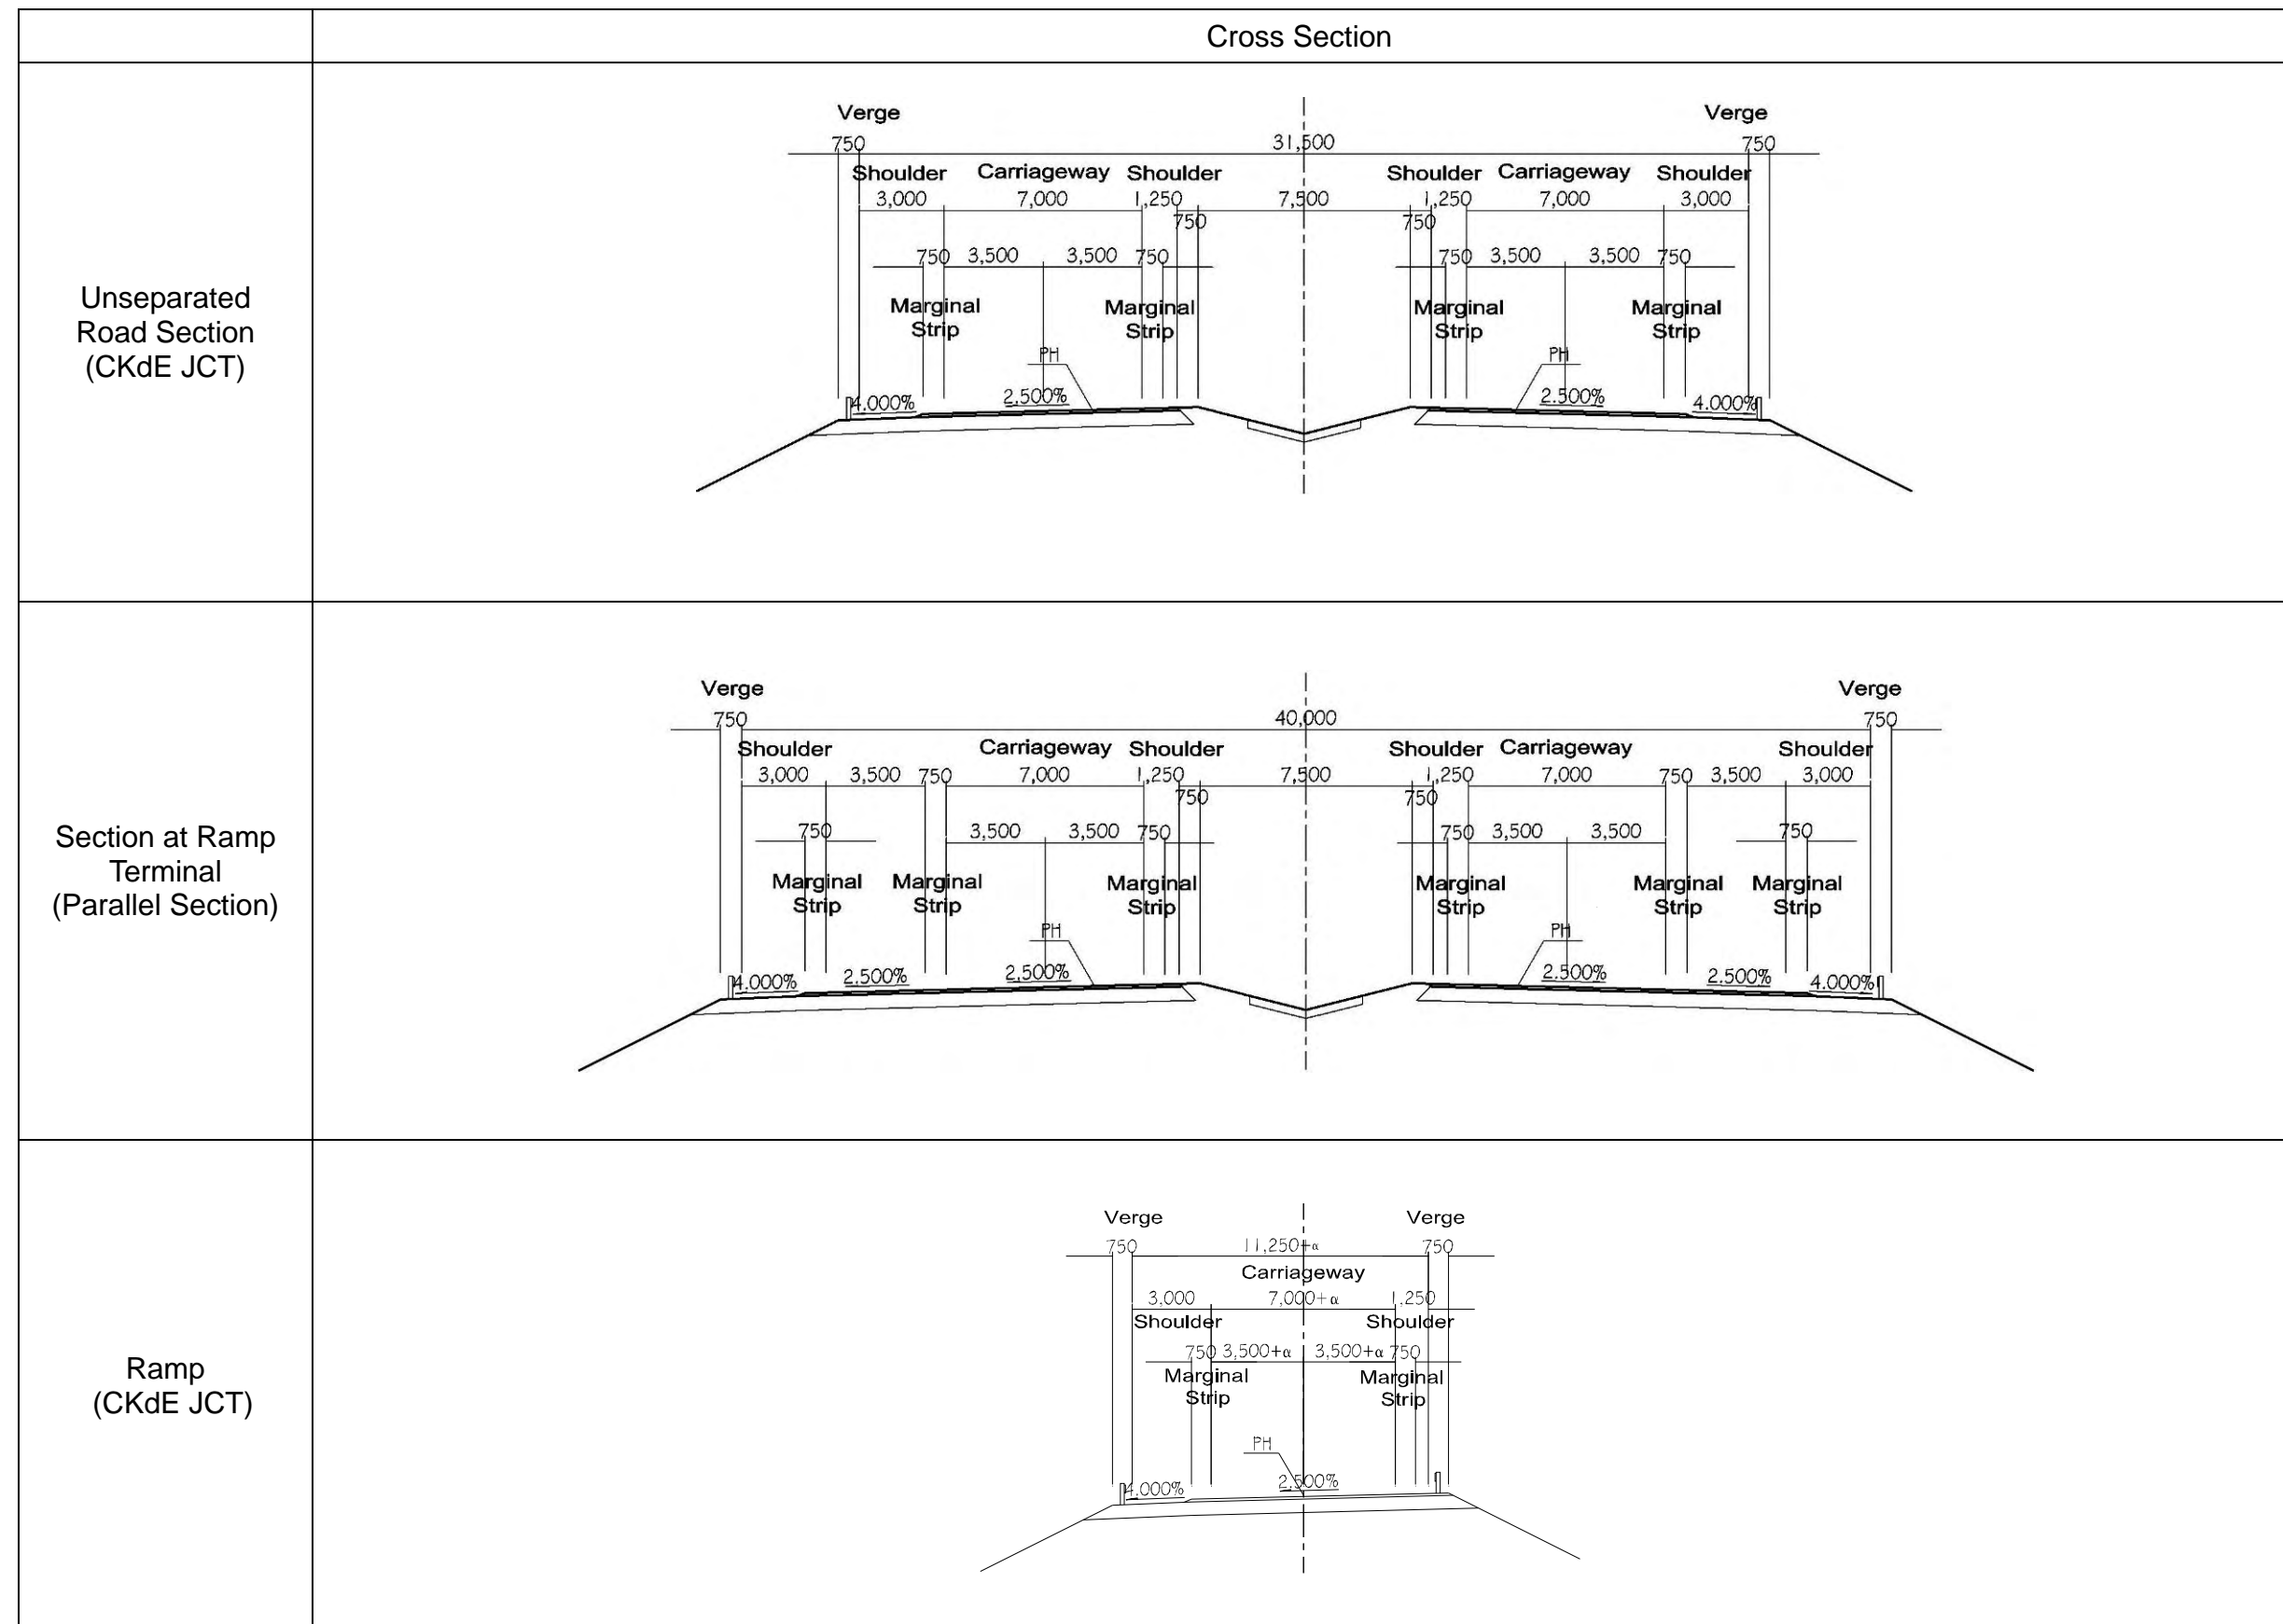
Cross Section of Ramp Terminal for CKdE Junction (Initial Stage)
